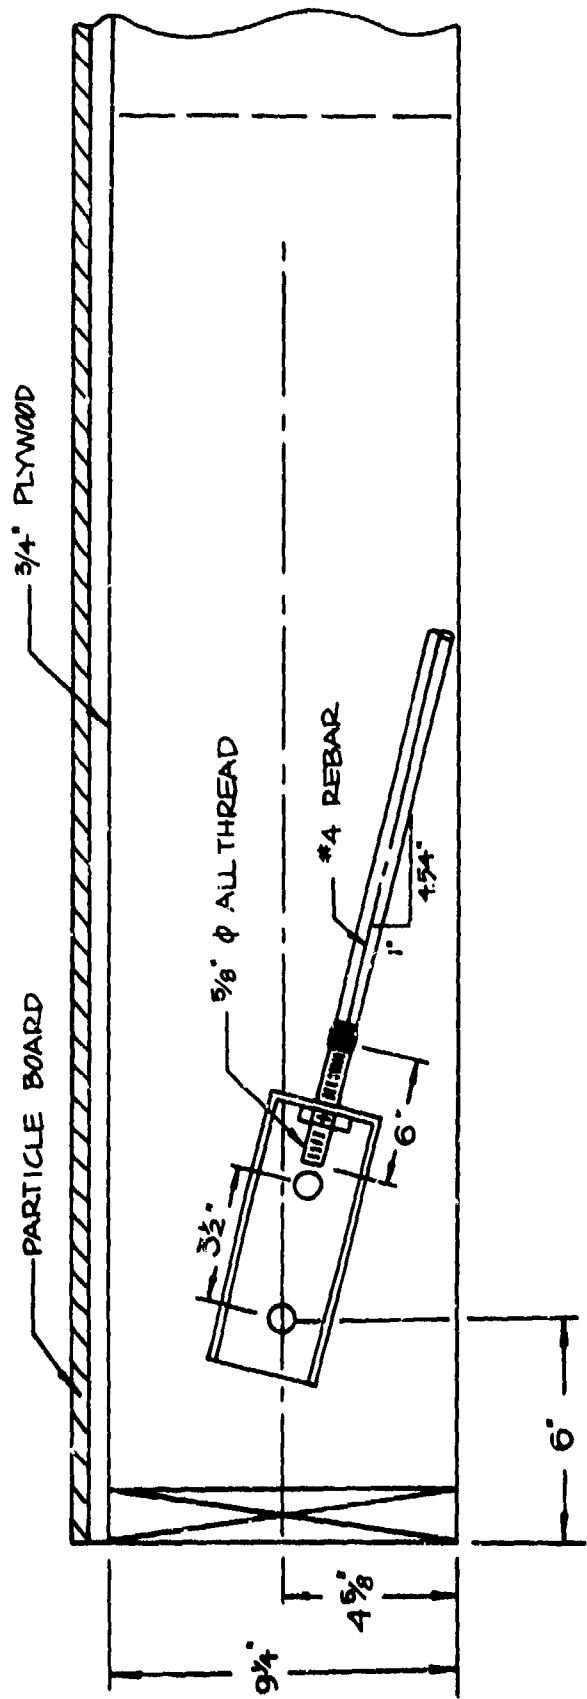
Construction Details—Rebar and Connections, Floor Panels 7 and 8.
